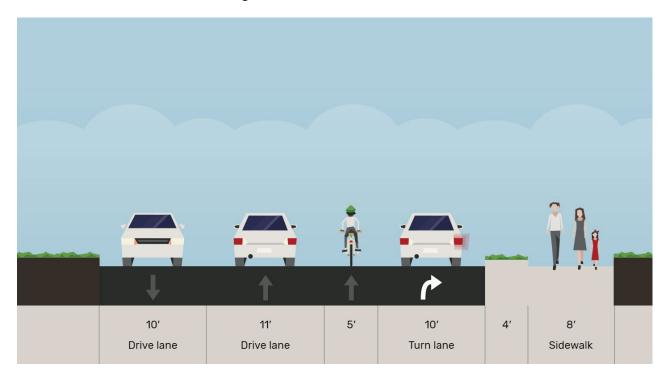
Existing Cross Section (Saxony Drive to Dameron Drive)
